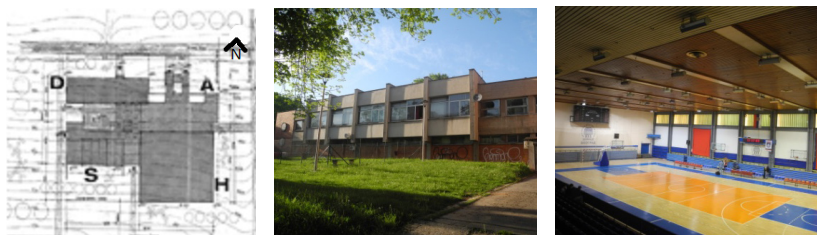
Building layout (left - A+D+S-the building without main hall, H-main hall), south façade of the Sport Centre Šumice (middle) and interior of the main sports hall (right). Source: Original project documentation, 1974. Archive of Vozdovac Municipality. Photos taken by Authors.
